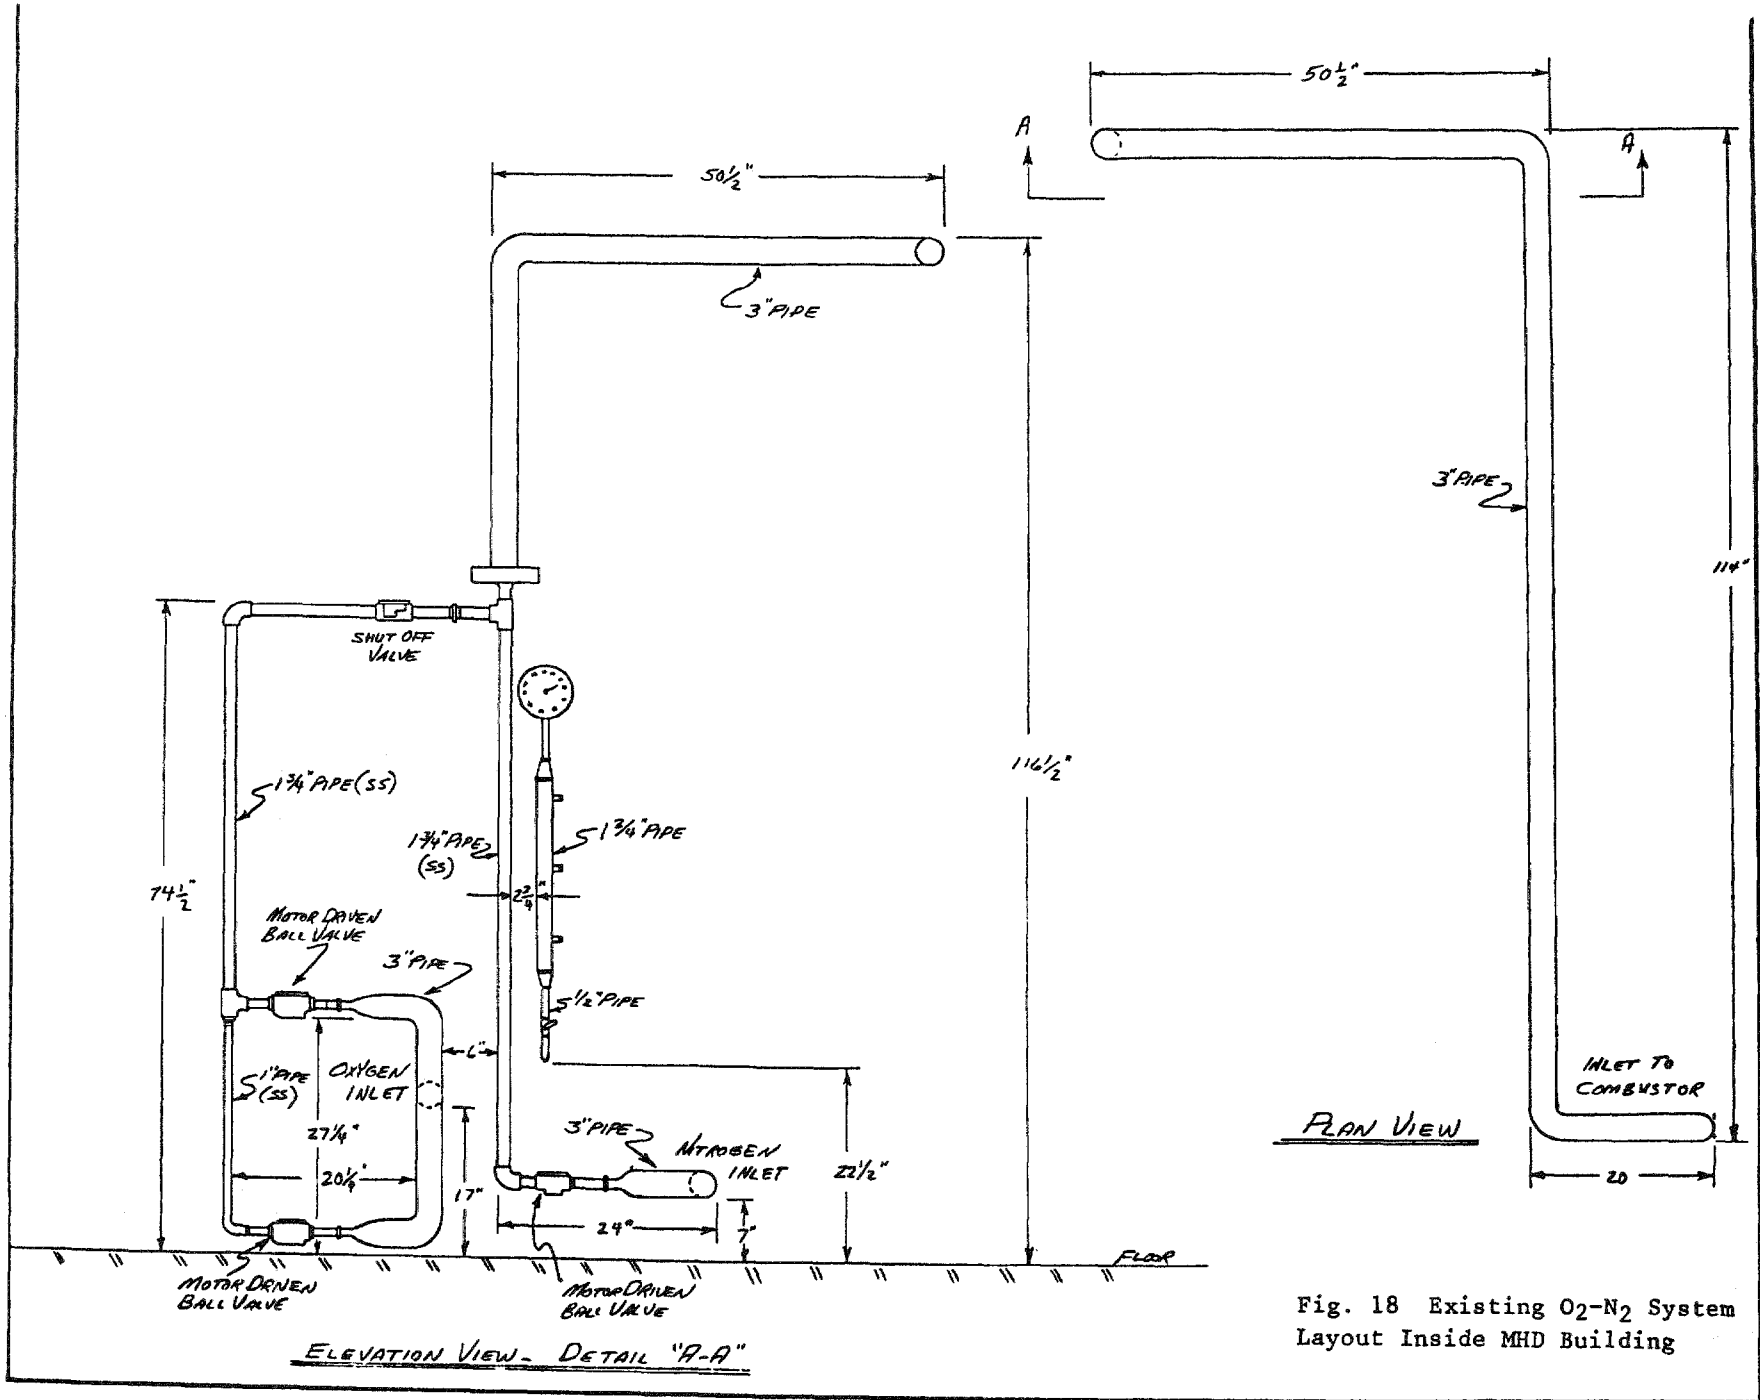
Existing O₂-N₂ System Layout Inside MHD Building
